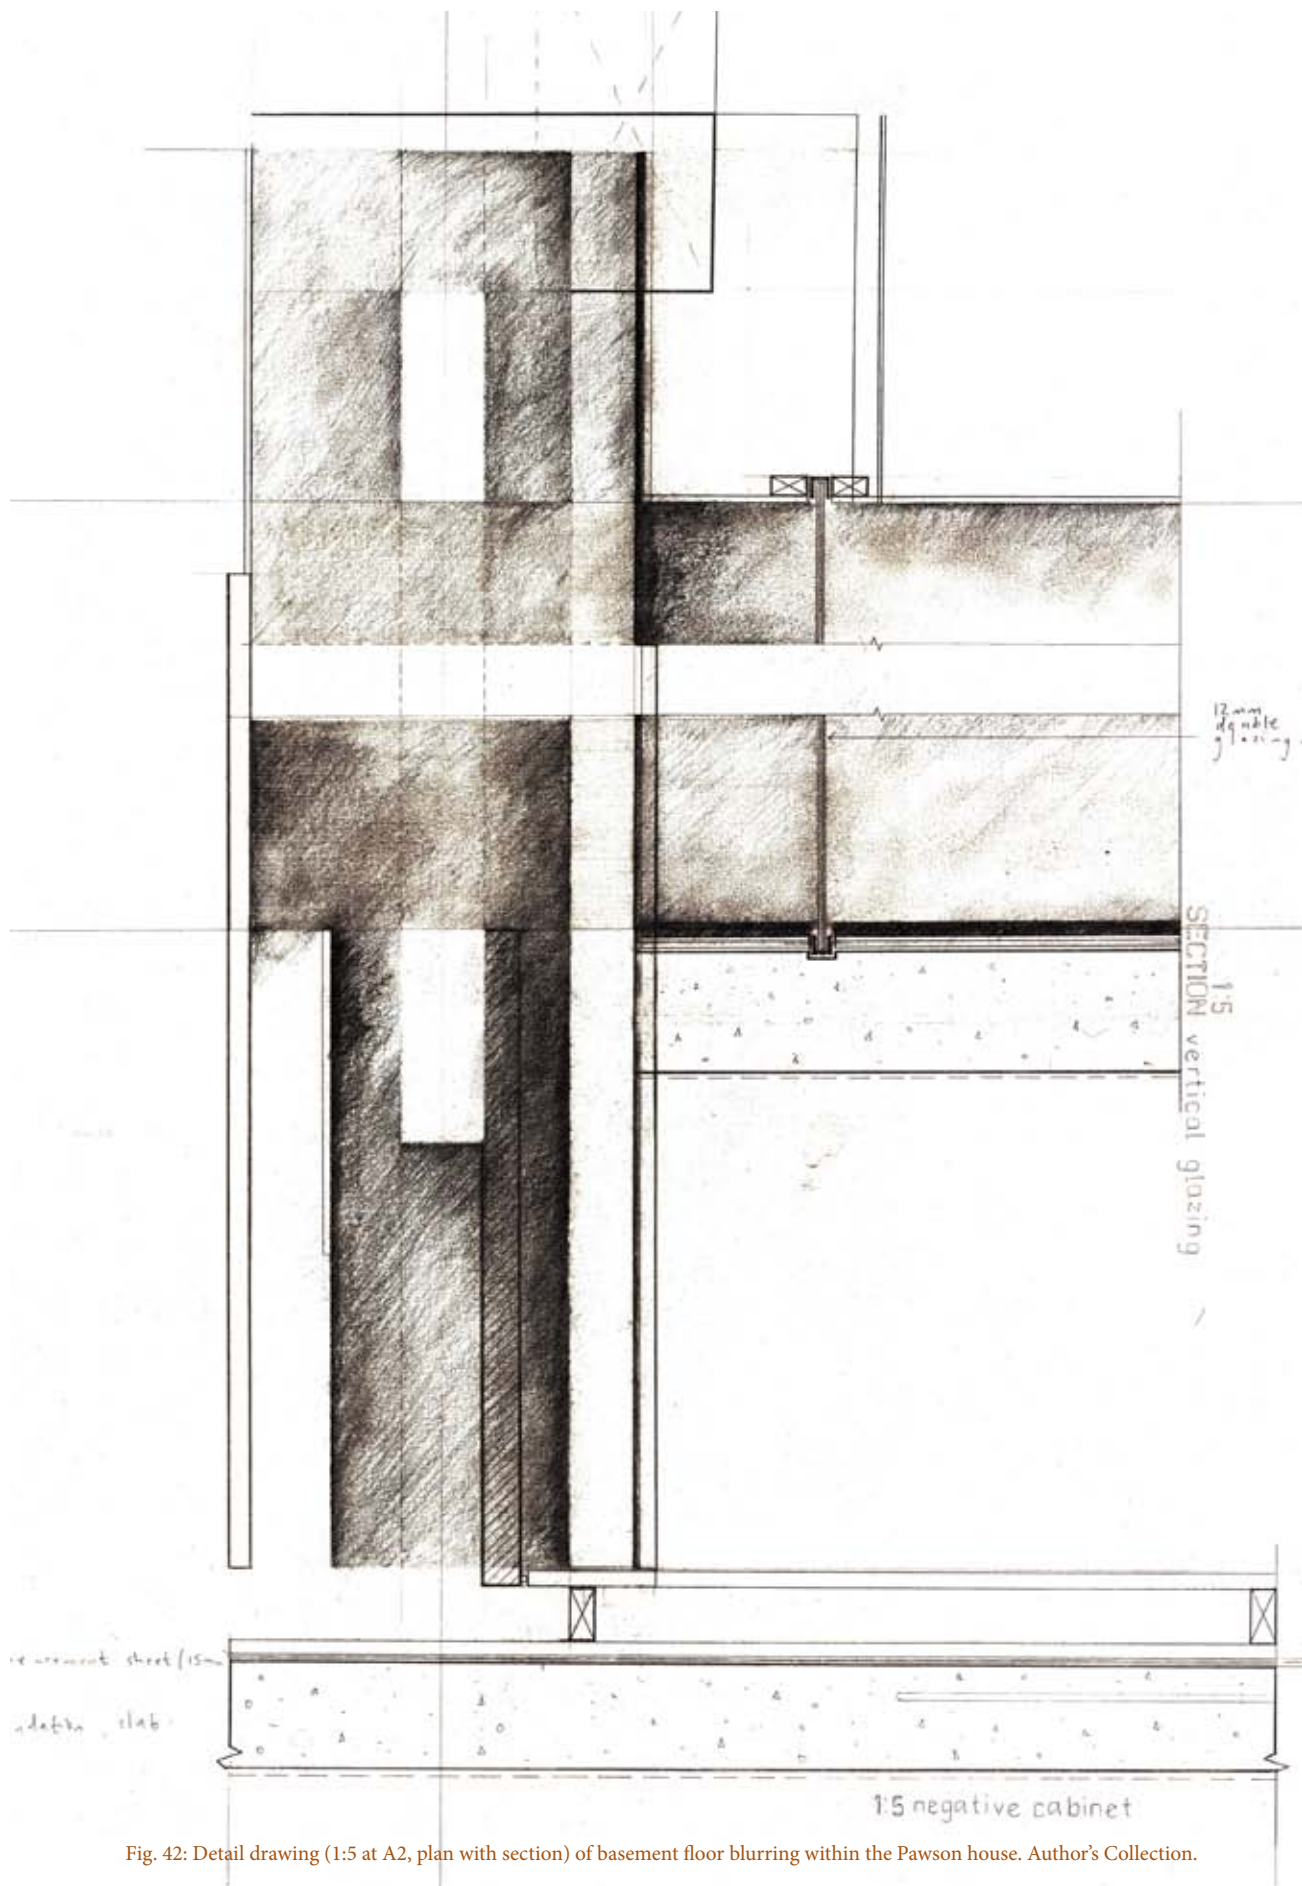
Detail drawing (1:5 at A2, plan with section) of basement floor blurring within the Pawson house. Author's Collection.
